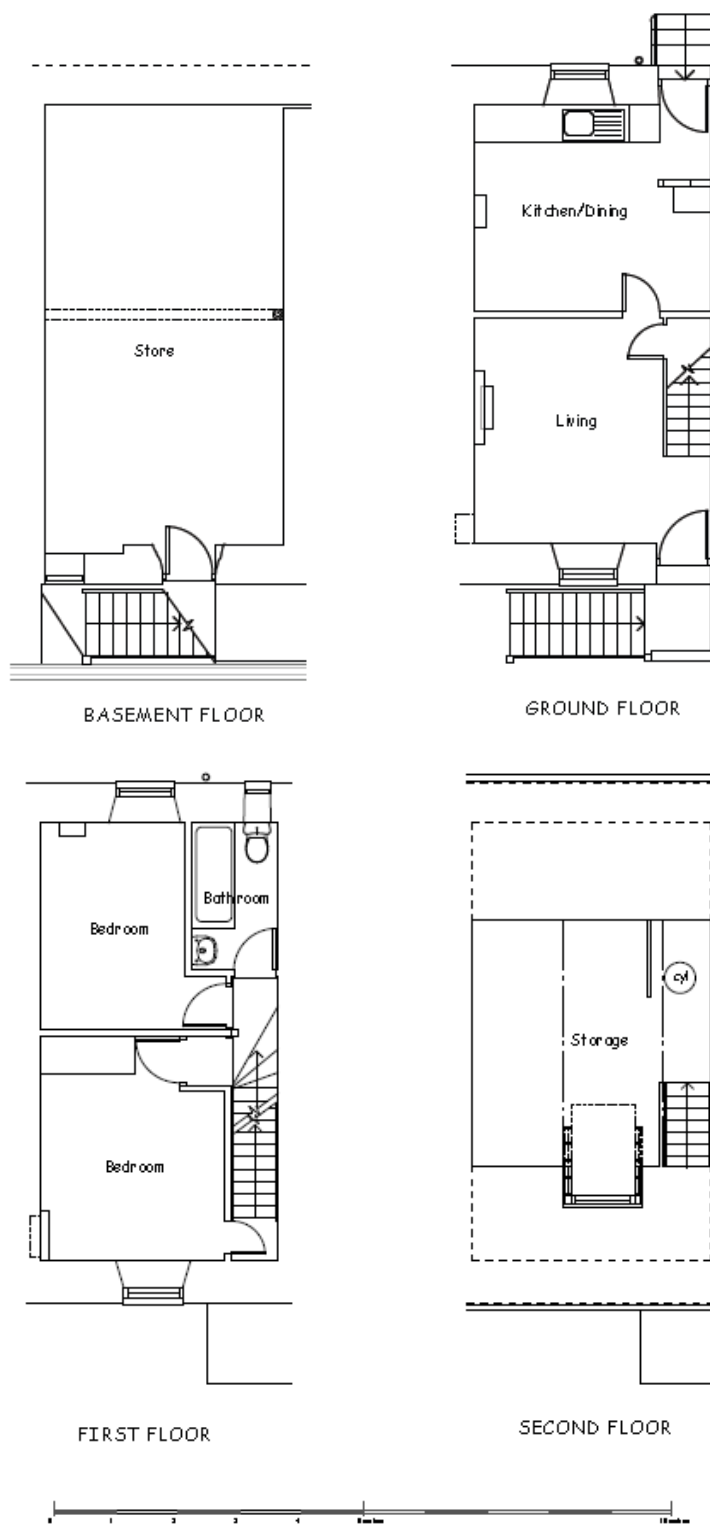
Plans of 14 Teetotal Street, existing (Andrew Williams, Architect, Aug 2011)
